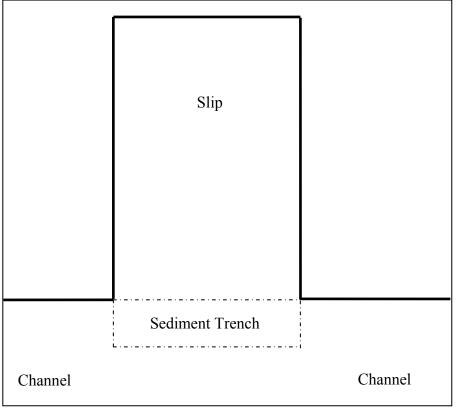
B. SEDIMENT TRENCH PLAN
